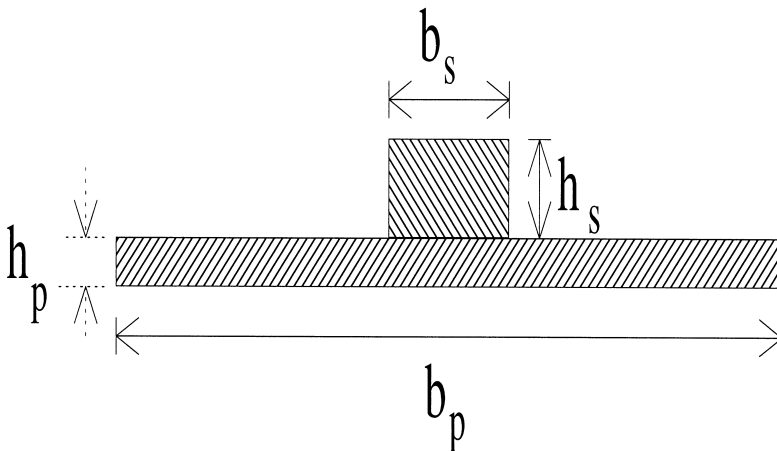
The cross-section of an eccentric beam-stiffened plate.
